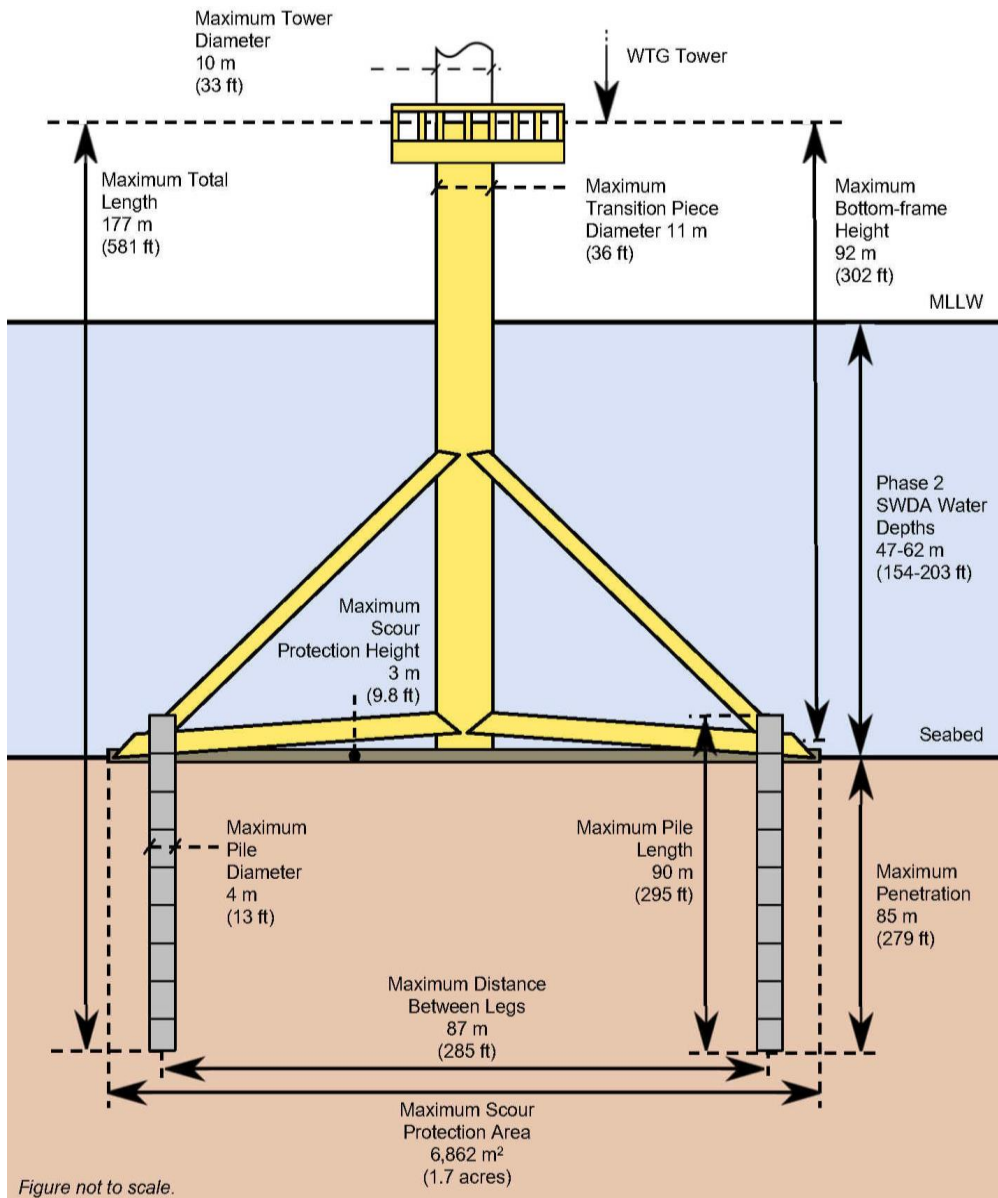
Schematic drawing of a bottom-frame foundation (Figure 4.2-5 of the New England Wind Draft Construction and Operations Plan Volume 1, Epsilon 2021).
